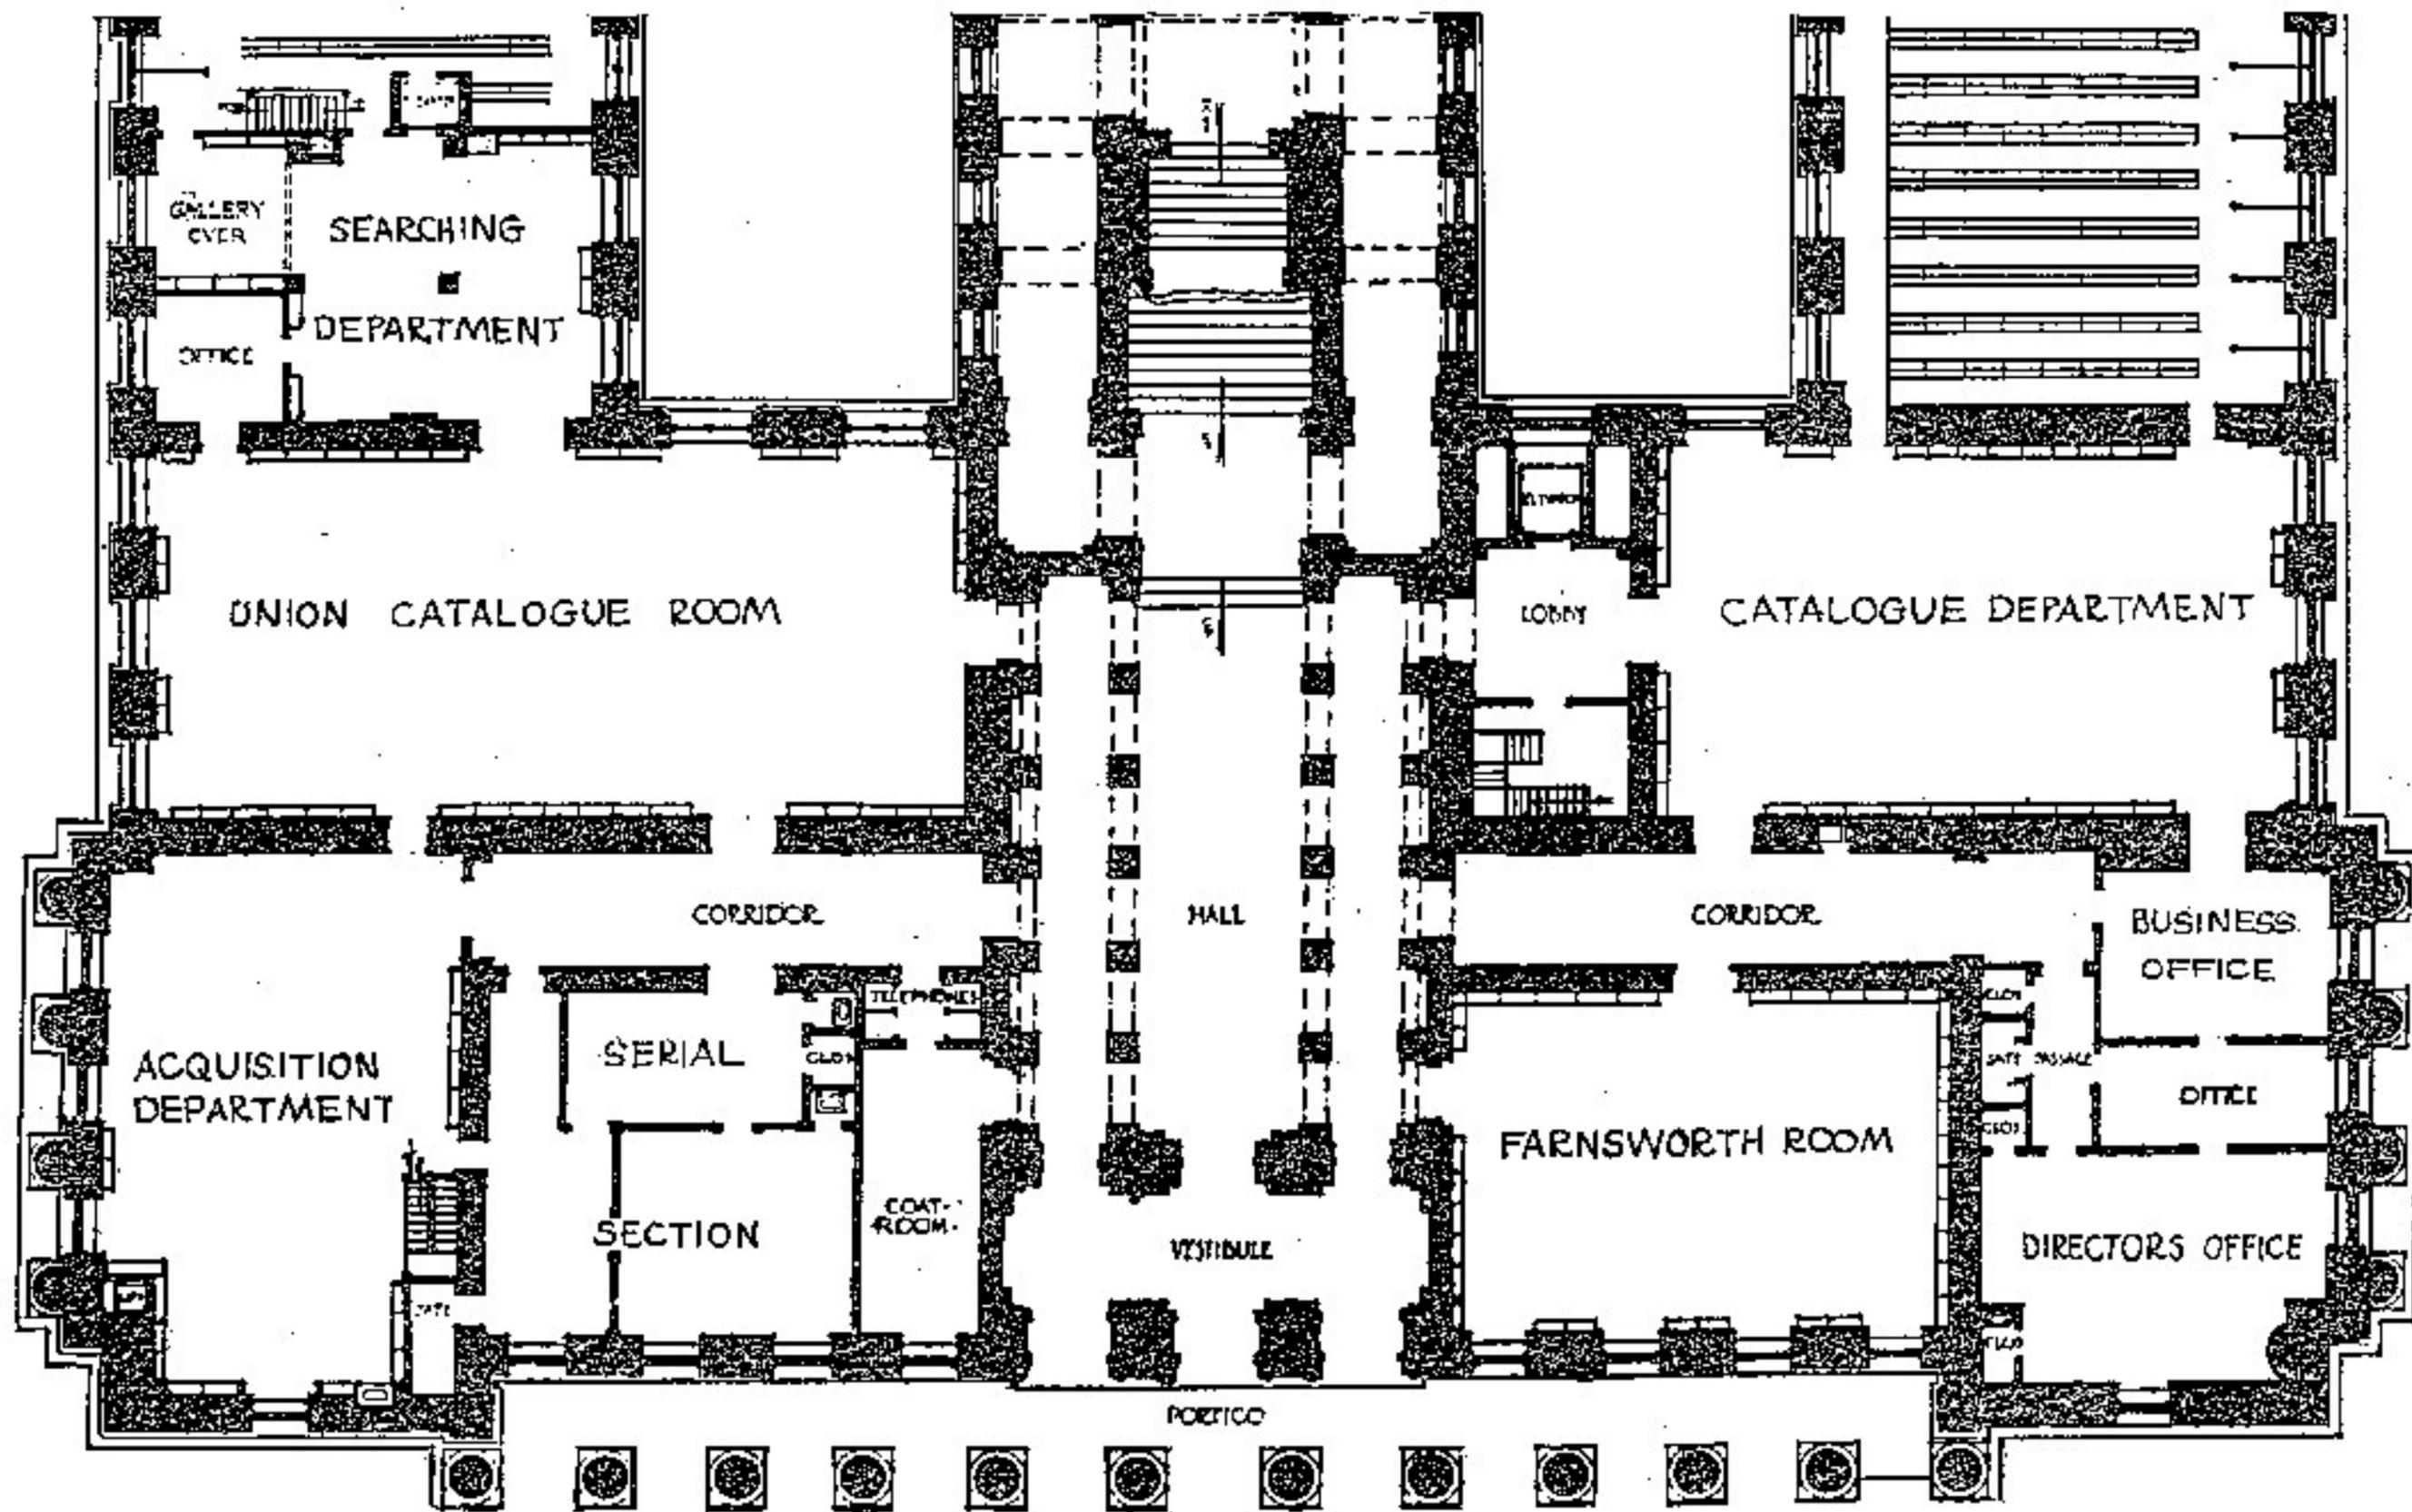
THE WIDENER BUILDING, FIRST FLOOR
